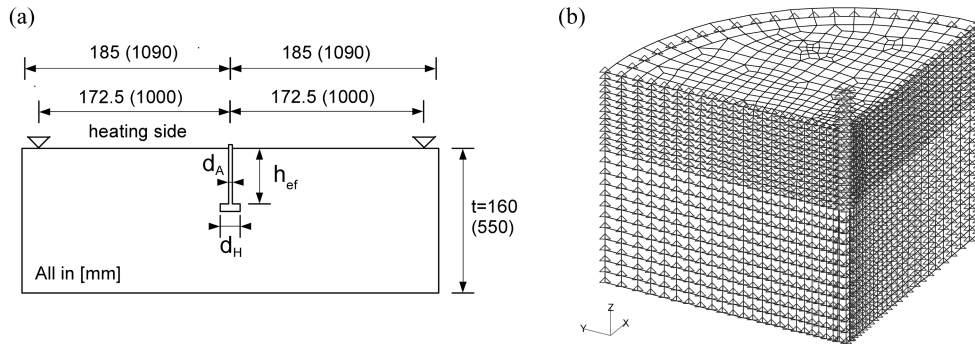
Pull-out of the headed stud anchor from a concrete block: (a) Geometry of the specimen, (b) Typical finite element discretization of the concrete specimen
